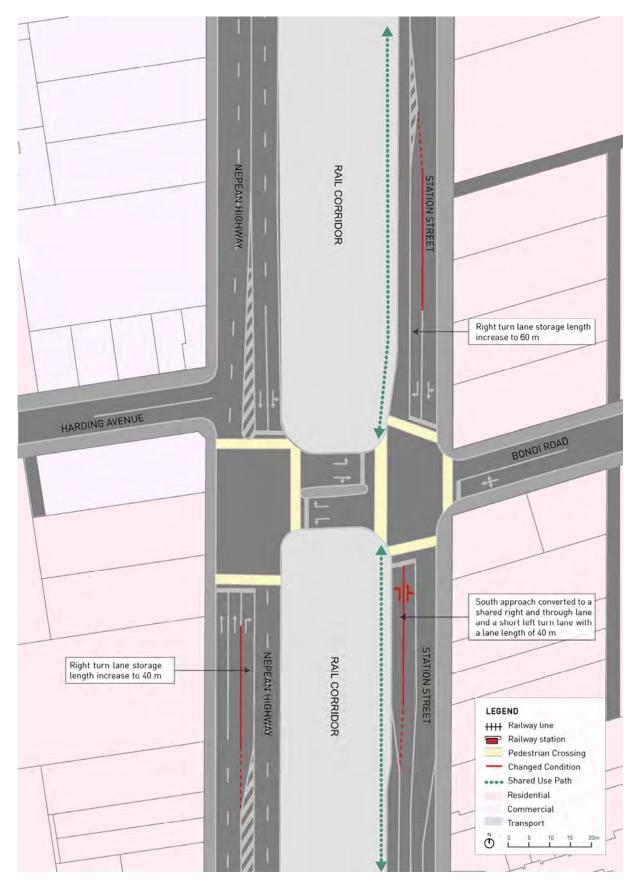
Nepean Highway, Station Street and Bondi Road intersections proposed layout
